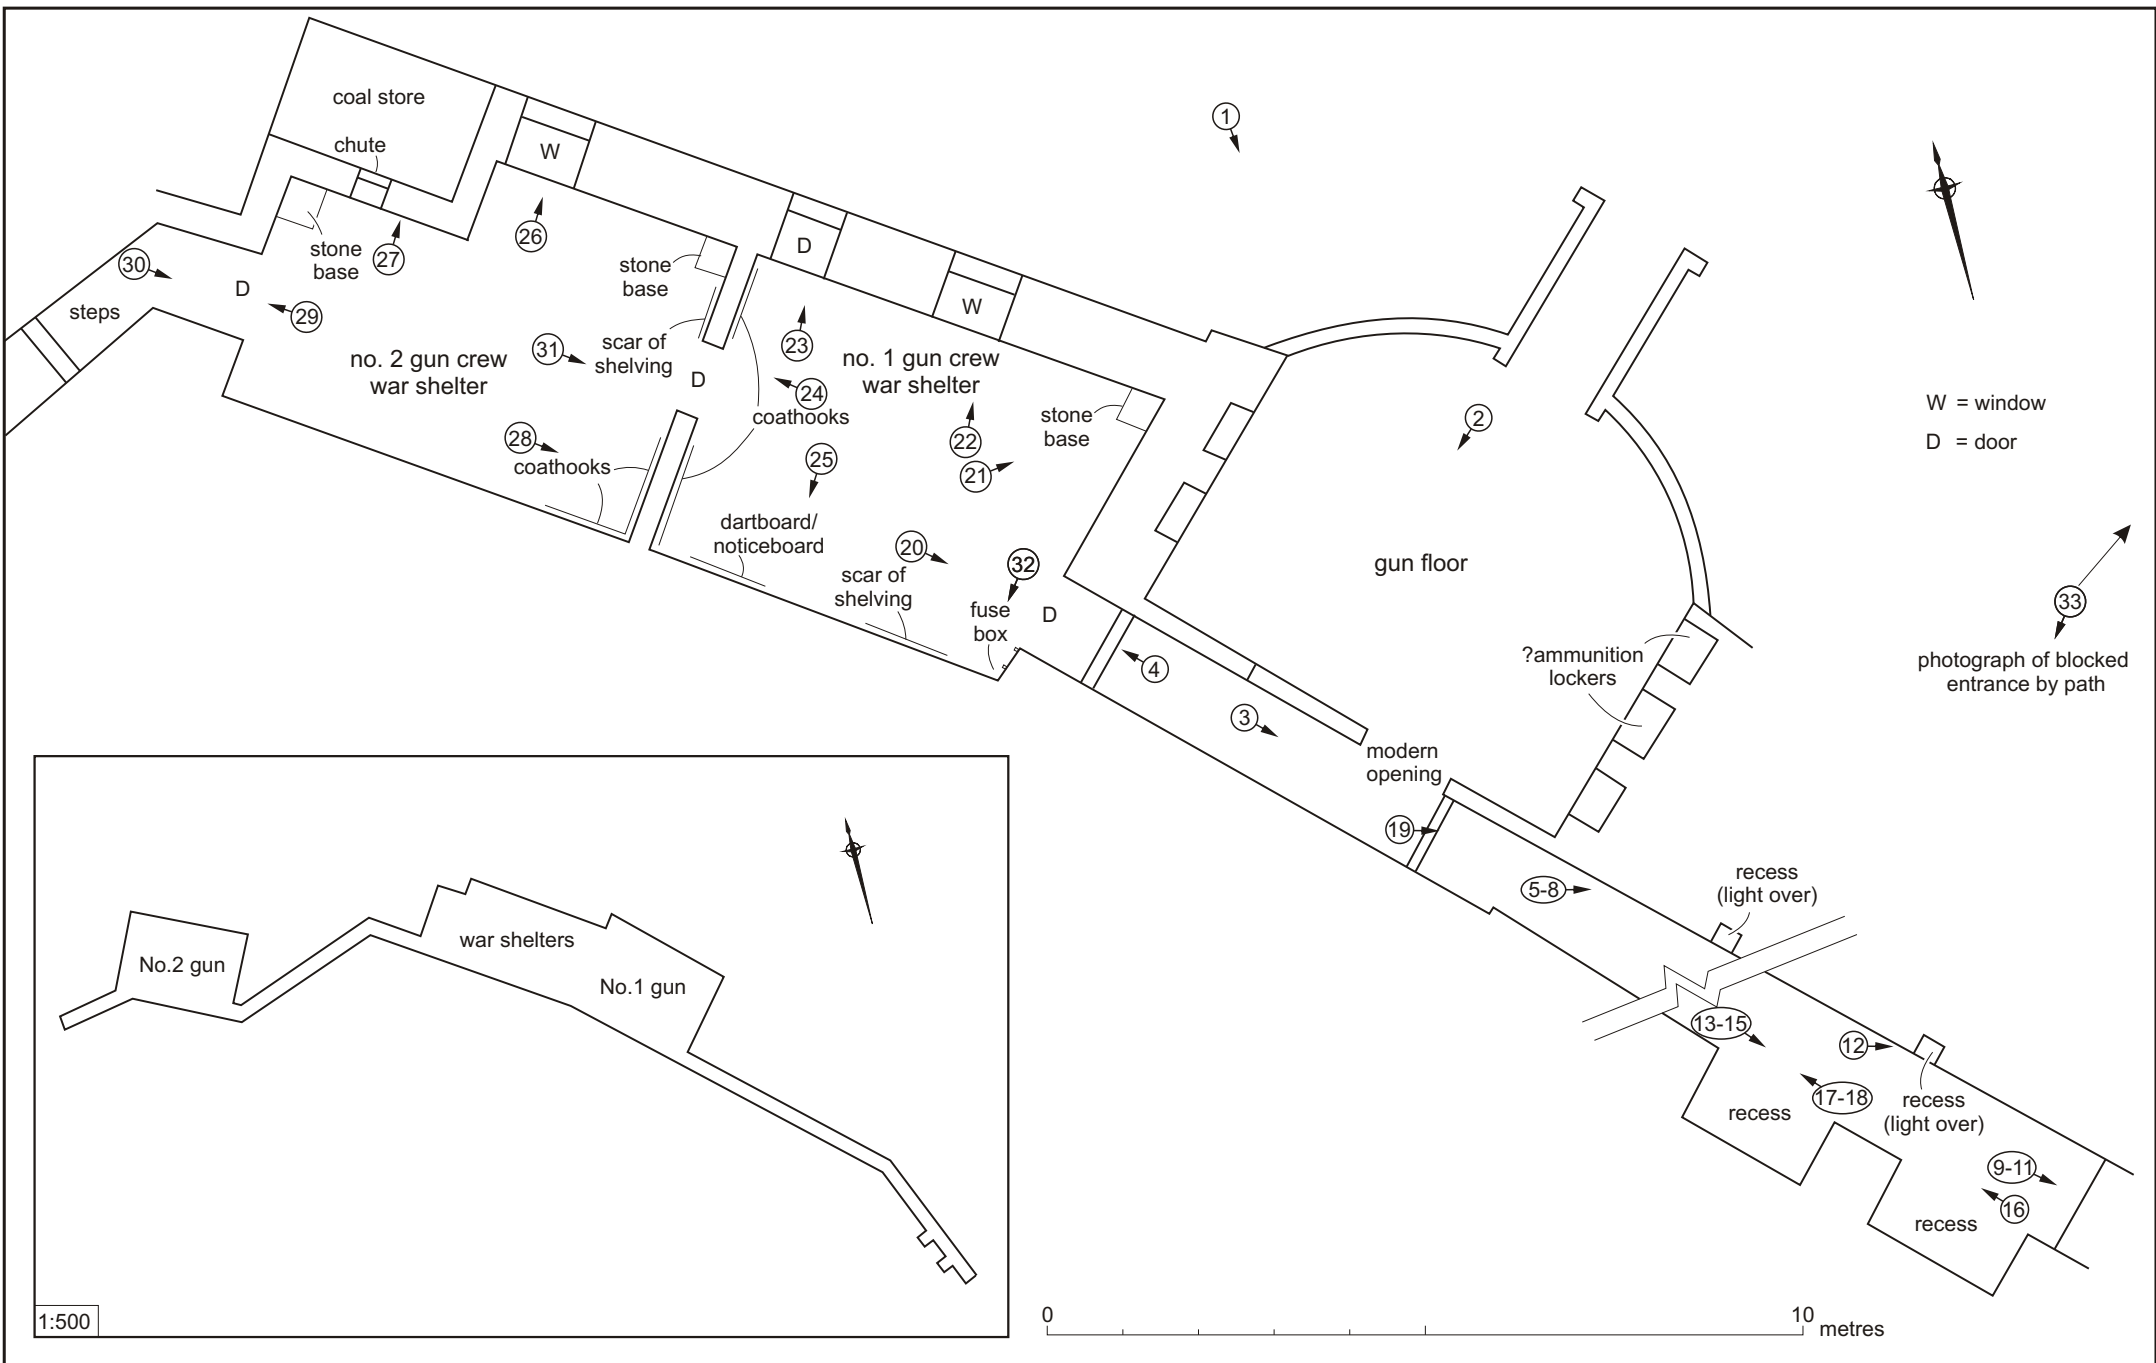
Sketch plan of the site showing location and direction of photographs (based on a plan provided by the Brixham Battery Heritage Centre Group).
